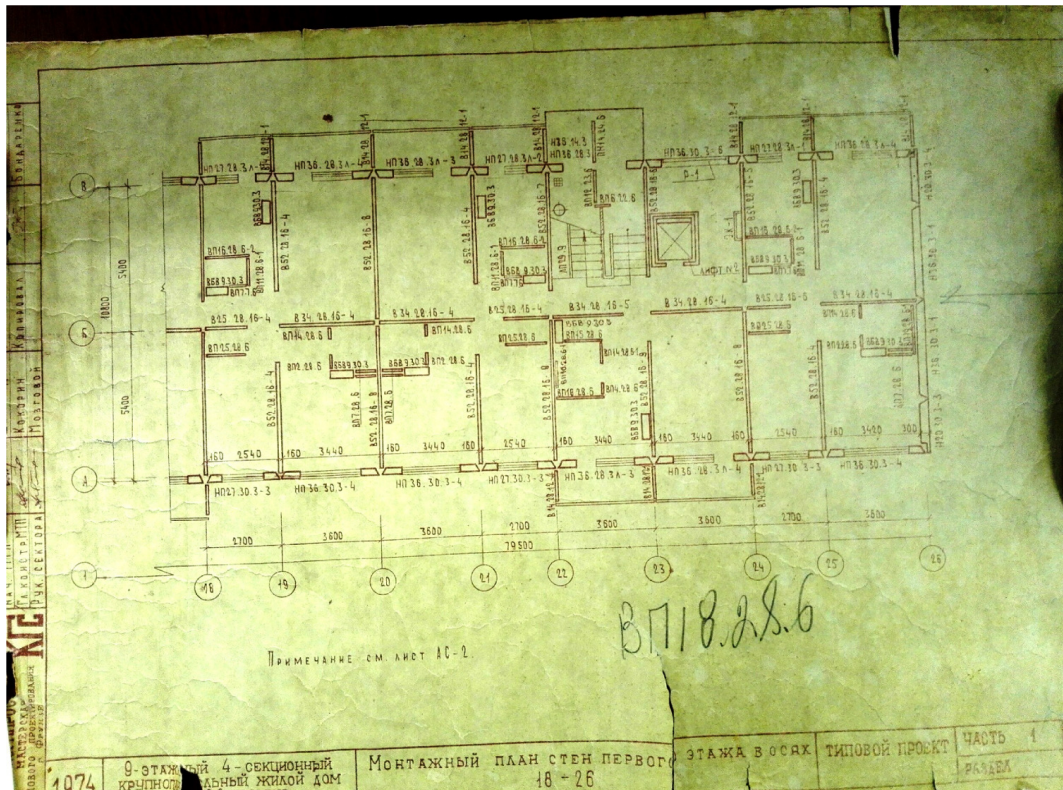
Plan view of a typical building of the series 105 (from the Institute of seismic-resistant construction in Bishkek). This plan shows only half of the building. We assumed that the other half would be symmetric, as could be observed from the building inspections for buildings 37 and 43. The distribution of the internal walls observed in the inspection is well represented in this plan.
